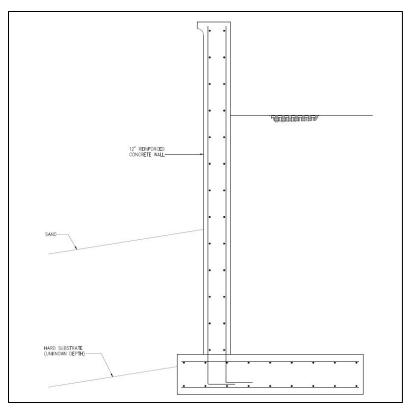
Conceptual section view of a new cast-in-place seawall at KAN
